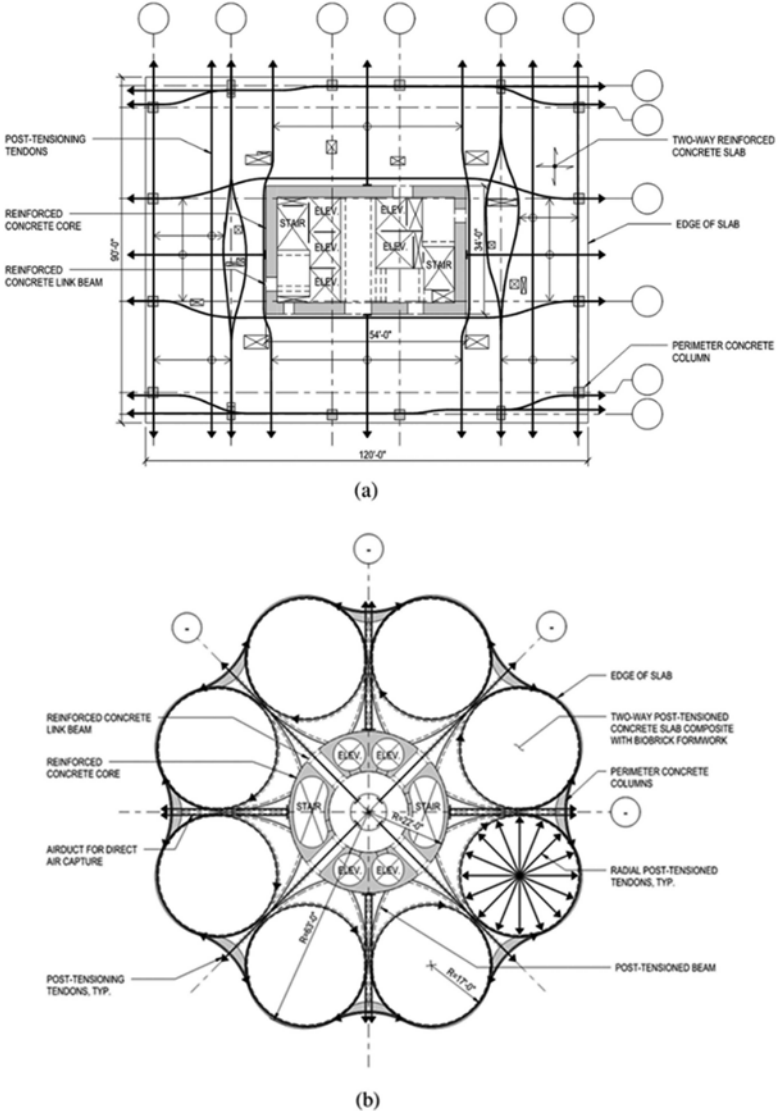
Structural plan of Benchmark Tower (a) and Urban Sequoia Tower (b).
